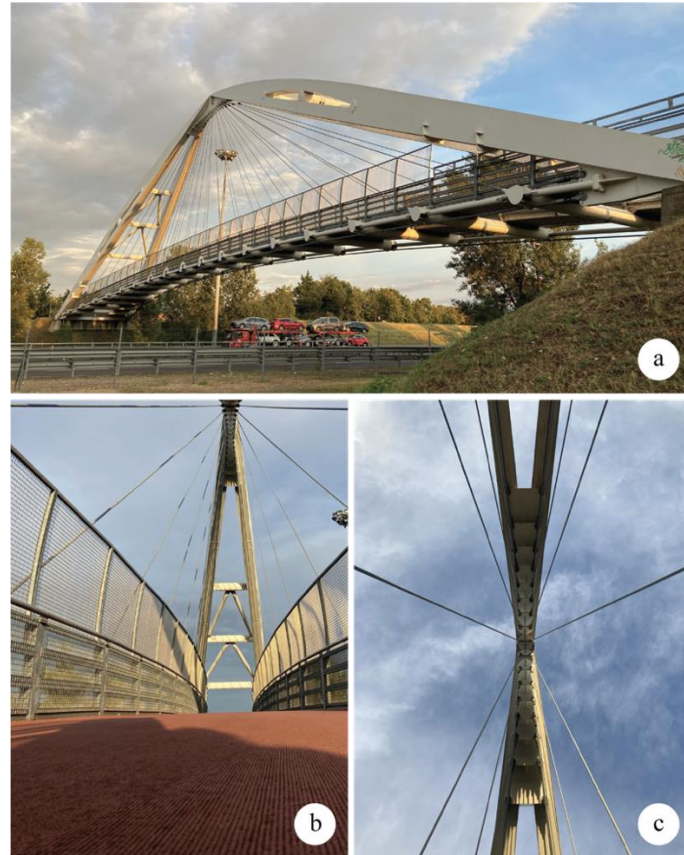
Case study: (a) Lateral view (Northside), (b) A-shaped frame and detail of the deck pavement, (c) Cable-stayed system
